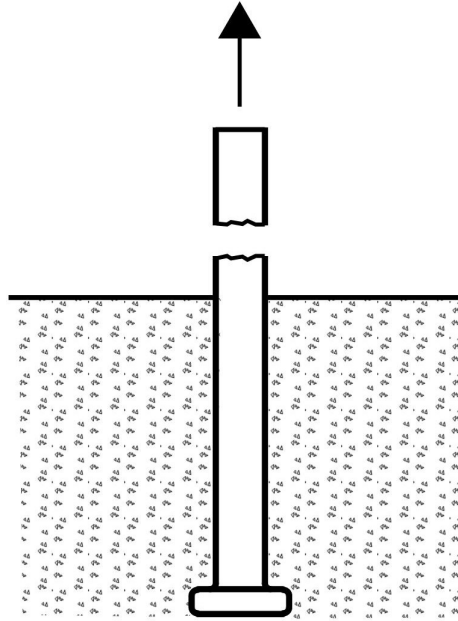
Steel failure of a headed anchor, embedded in concrete, under tension loading
